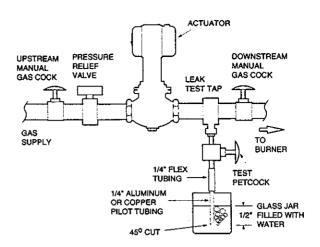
Test Setup for Checking Through-the-Valve Leakage
